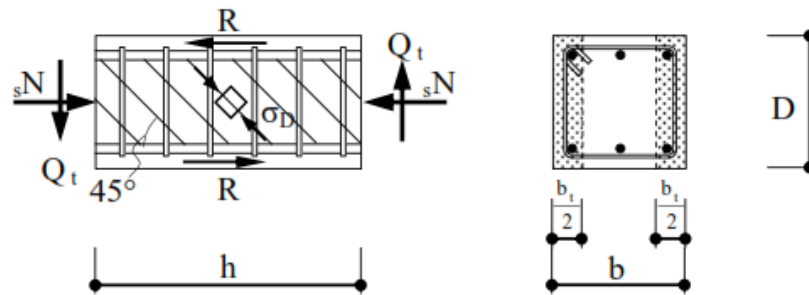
Truss Mechanism with Bond Splitting Failure
